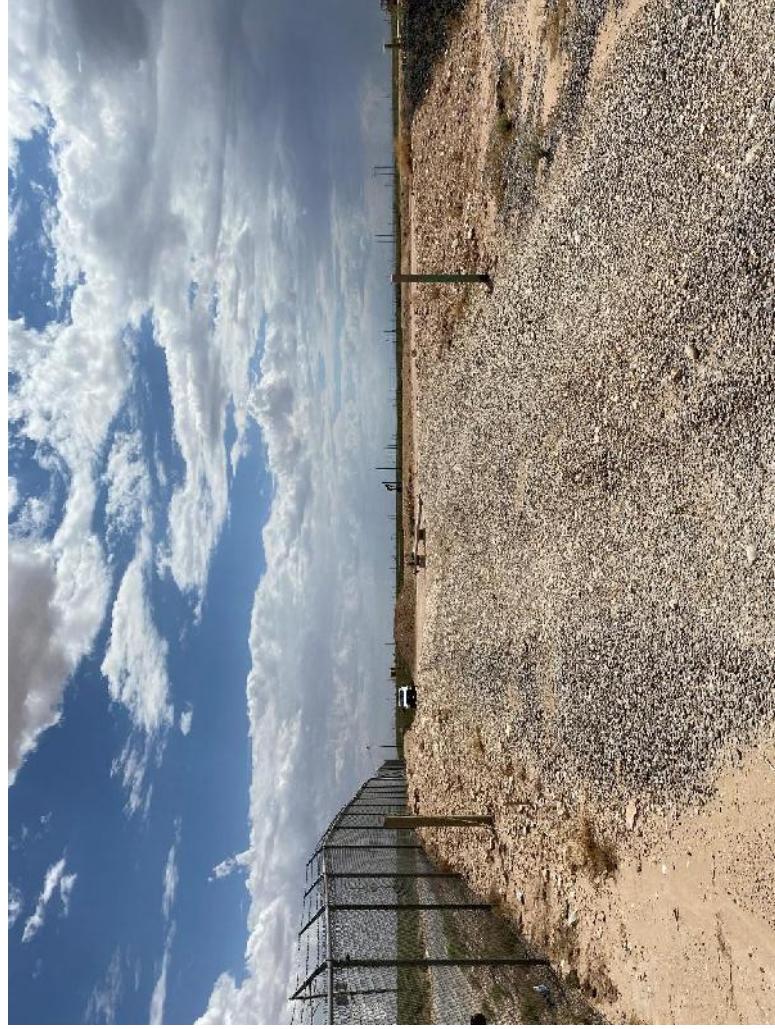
Photograph location 11. August 22, 2024. Southeast of building facing south. View of the northern tank berm of former Tank 970 – SB-3 location south of berm.
